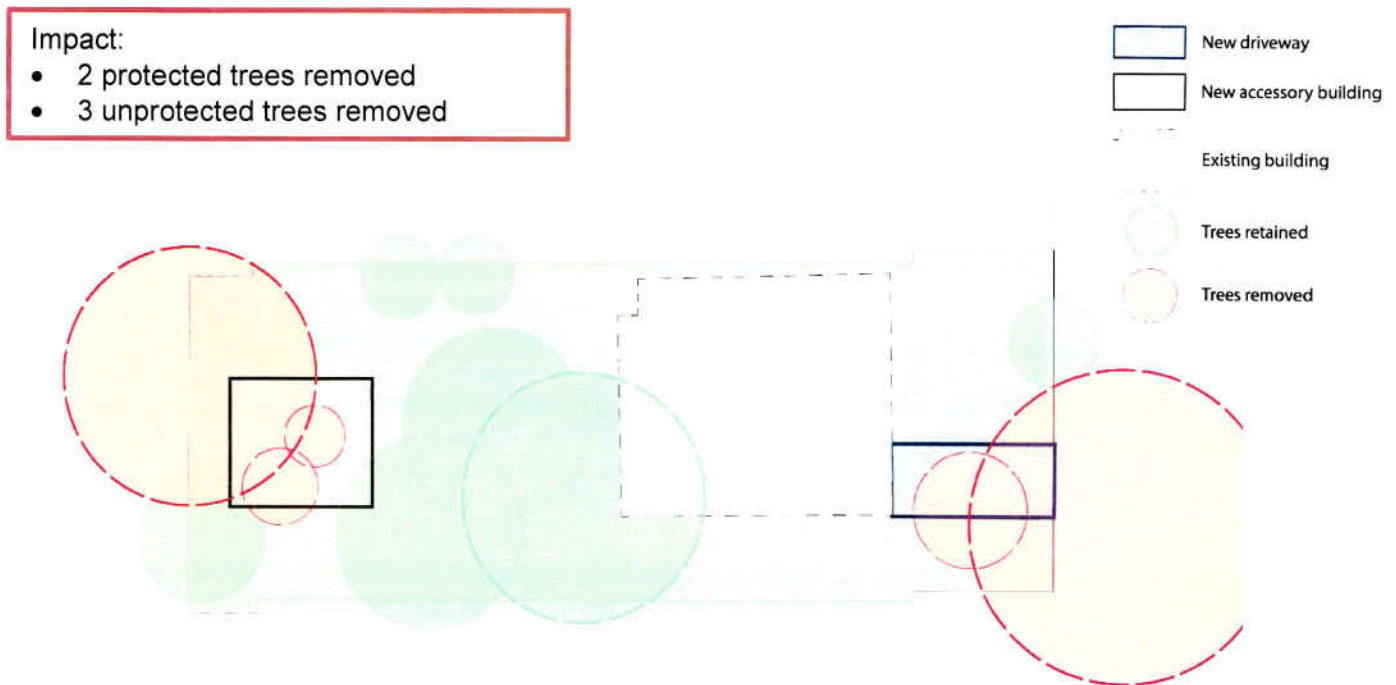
The new accessory building and driveway could be placed to require the removal of several protected trees under the current bylaw.
